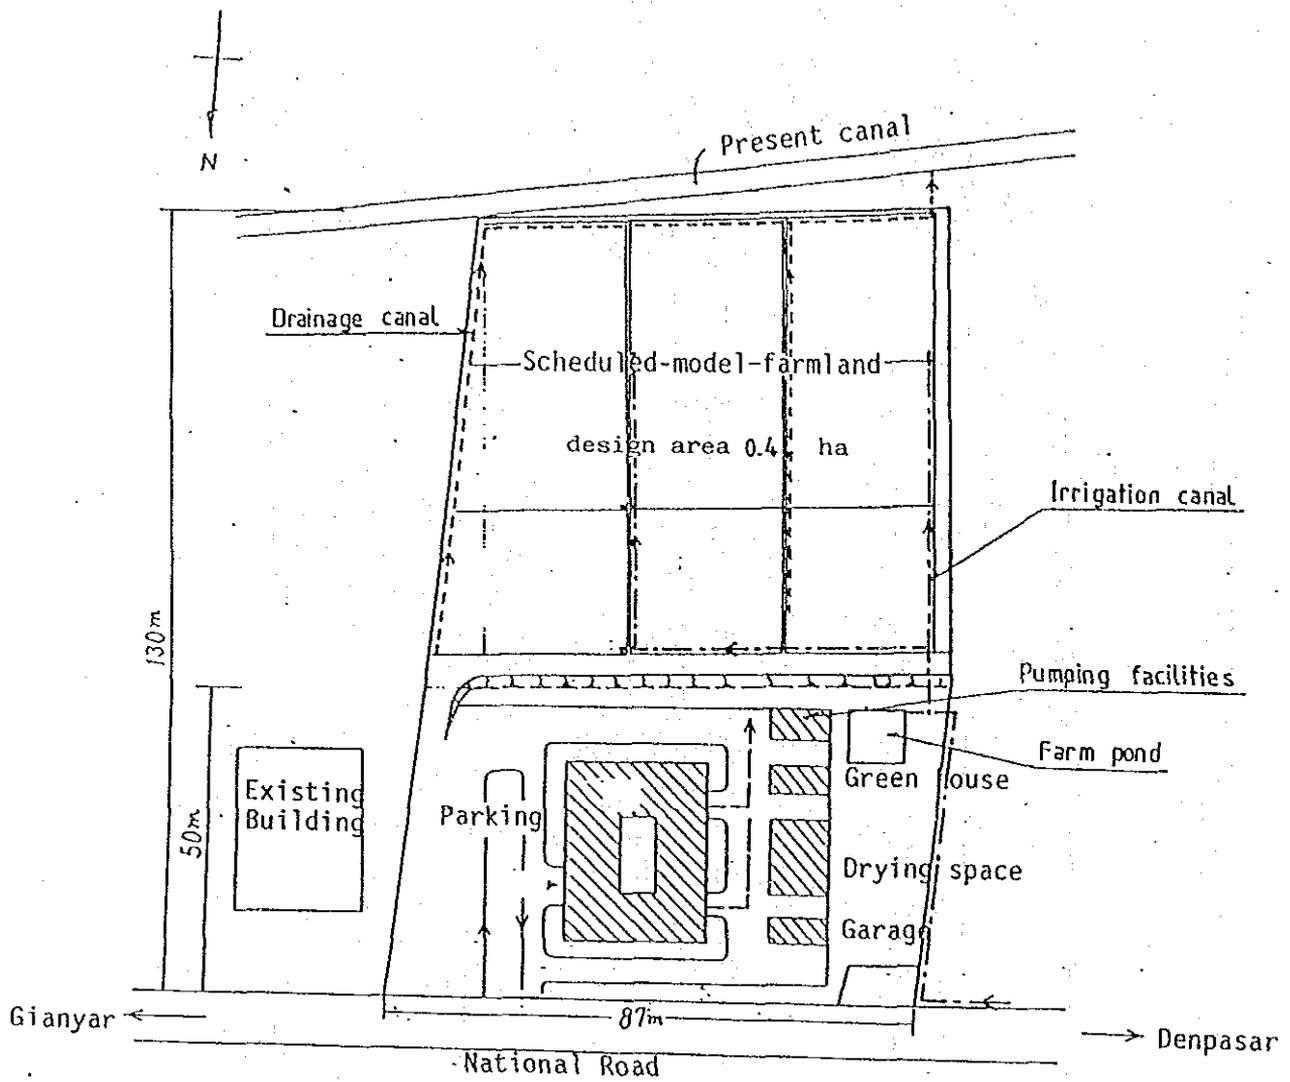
Plan of Celuk Field Laboratory (Basic plan)
